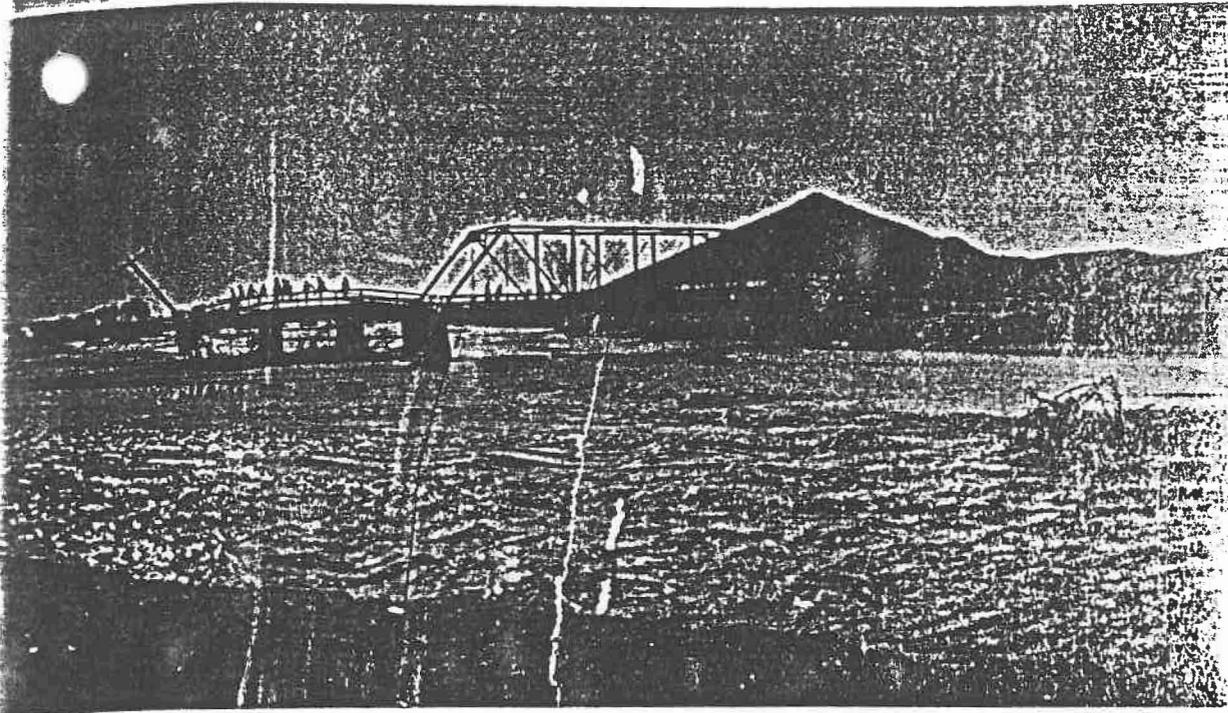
Erosion damage to the east abutment of the Congress Street bridge on February 1, 1915. The view is upstream (south), and Sentinel Peak ("A" Mountain) is visible at right. The gap of 60 m from the bridge to the east bank (left in picture) resulted from the downstream migration of a meander bend on that bank. This meander bend was visible in a 1902 photograph (Betancourt and Turner, in press). Source: Arizona Historical Society, Tucson.
